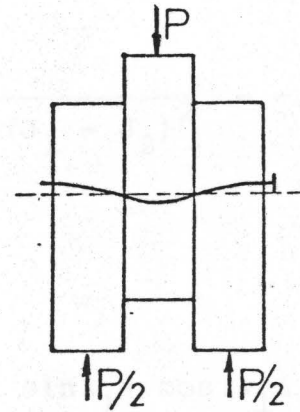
shows, in an exaggerated manner, the type of connector deformation which occurs when a built-up timber column buckles. Figure 3.1 also shows the connector deformation in single and double shear timber connections. Comparing
